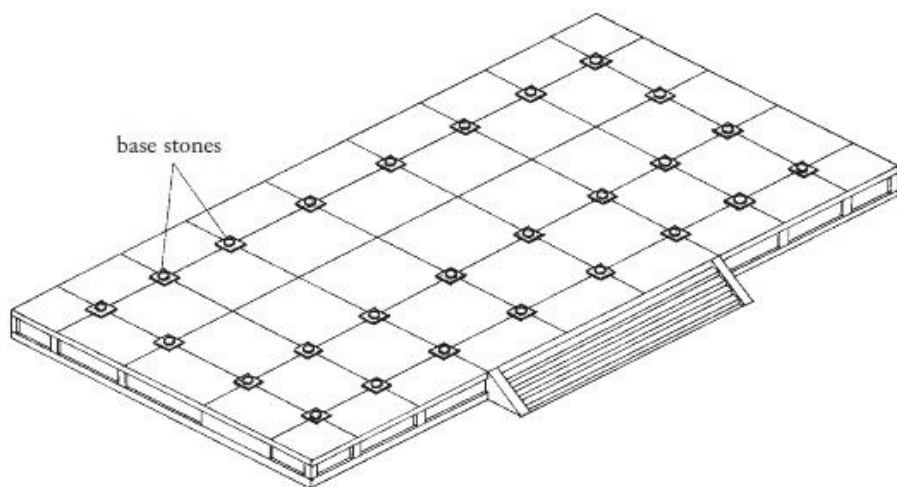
The Picture Hall after installation of the foundation platform and column base stones.
